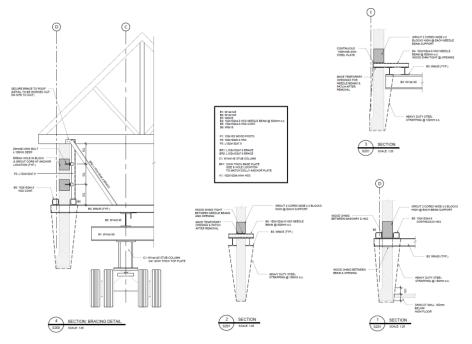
A series of drawings detailing the methodology for stabilizing the block walls by anchoring inserted pins in grout and introducing heavy duty steel strapping. Source: Cleland Jardine Structural Engineers 2022.
